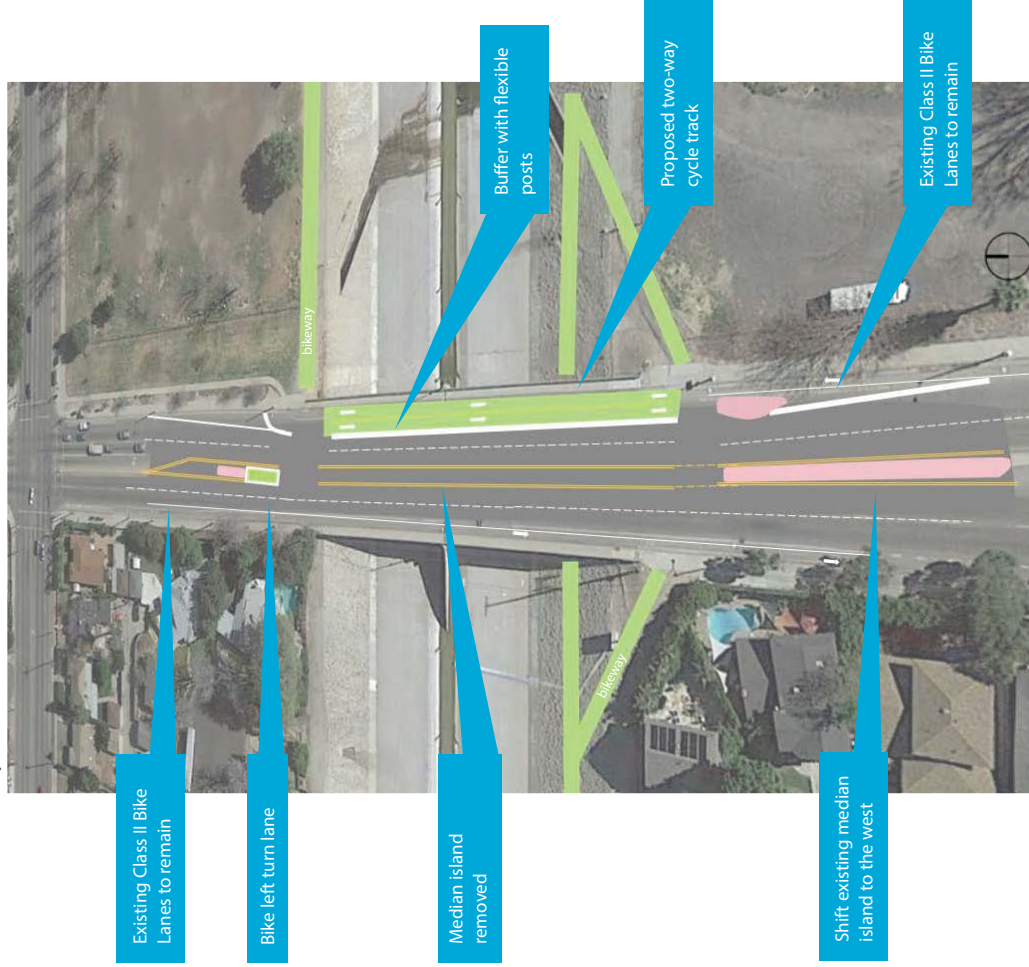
At-Grade Concept Plan for LA River Crossing at White Oak Avenue
